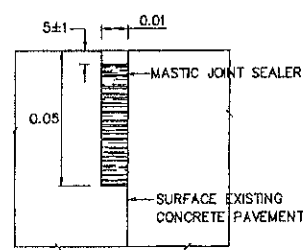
DETAIL OF SAWED FOR LONGITUDINAL JOINT
